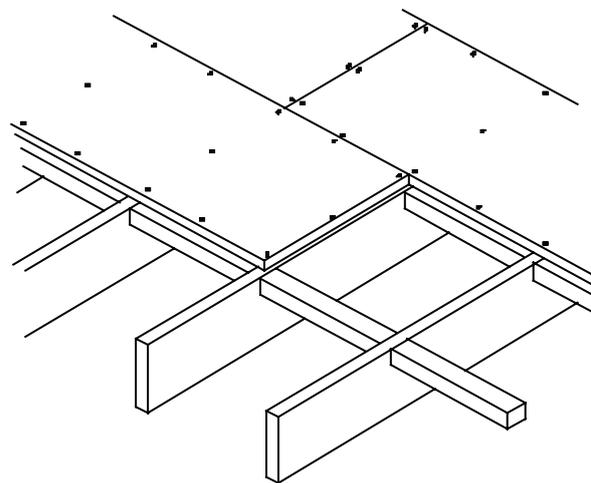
Square edge structural decking laid across the joists and supported by noggings
